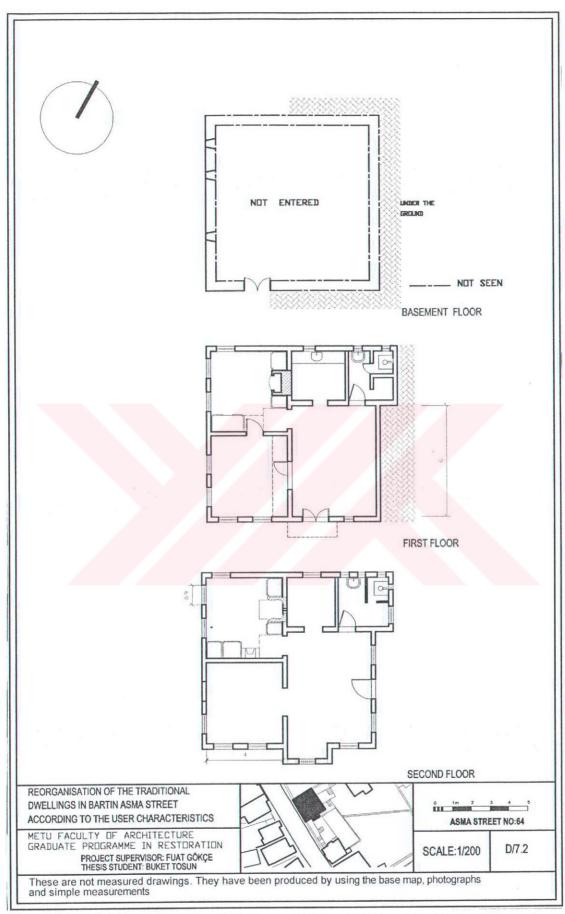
Sketch Drawings of Plans of The Building No:64
